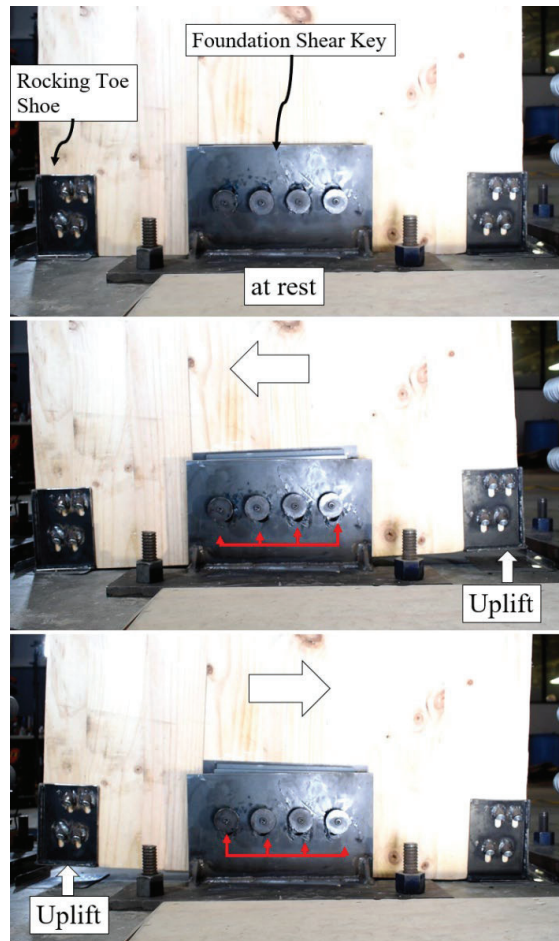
Rocking wall motion and transition between push and pull cycles at foundation level
